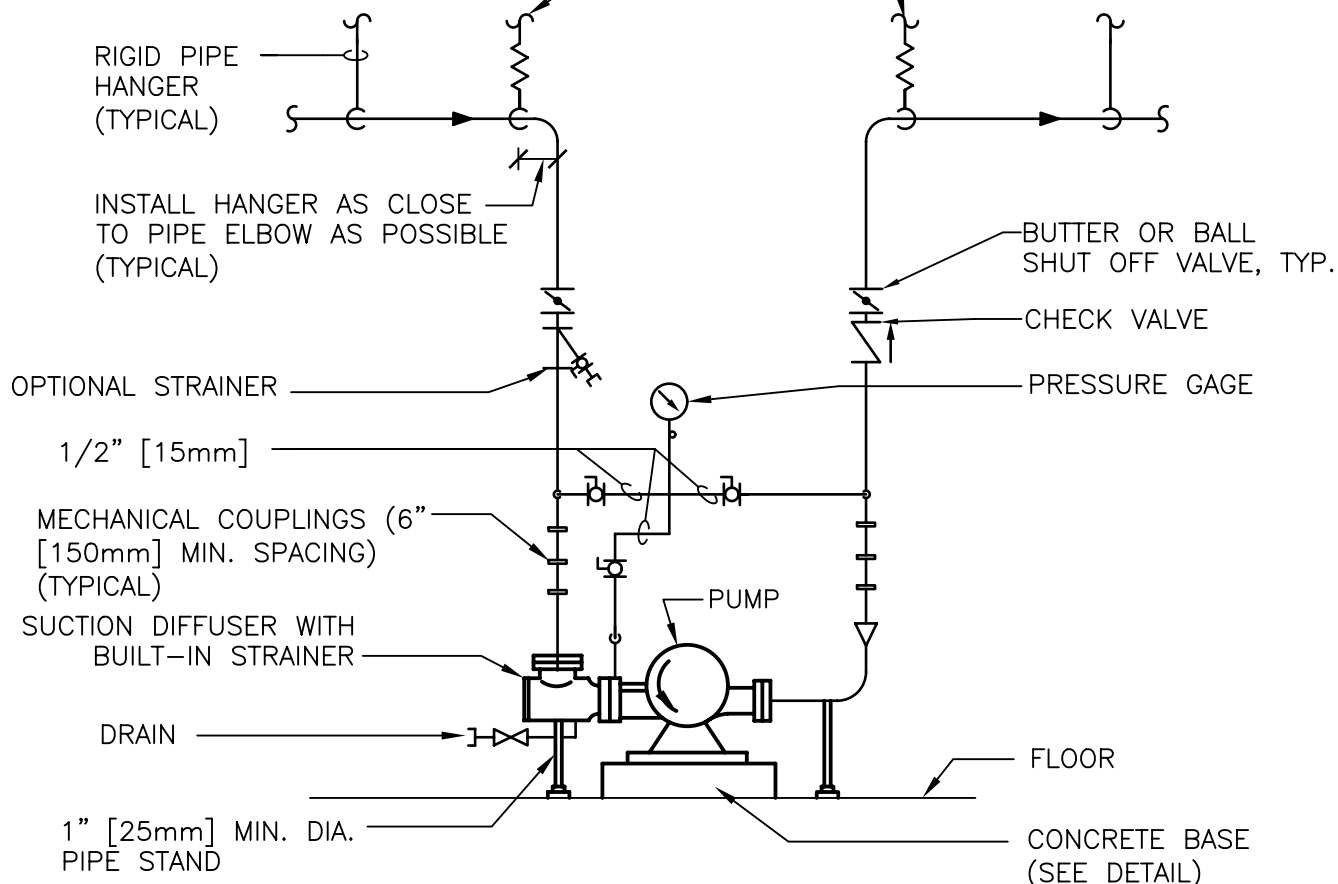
DETAIL TITLE / DOUBLE SUCTION FLOOR-MOUNTED PUMPS -
